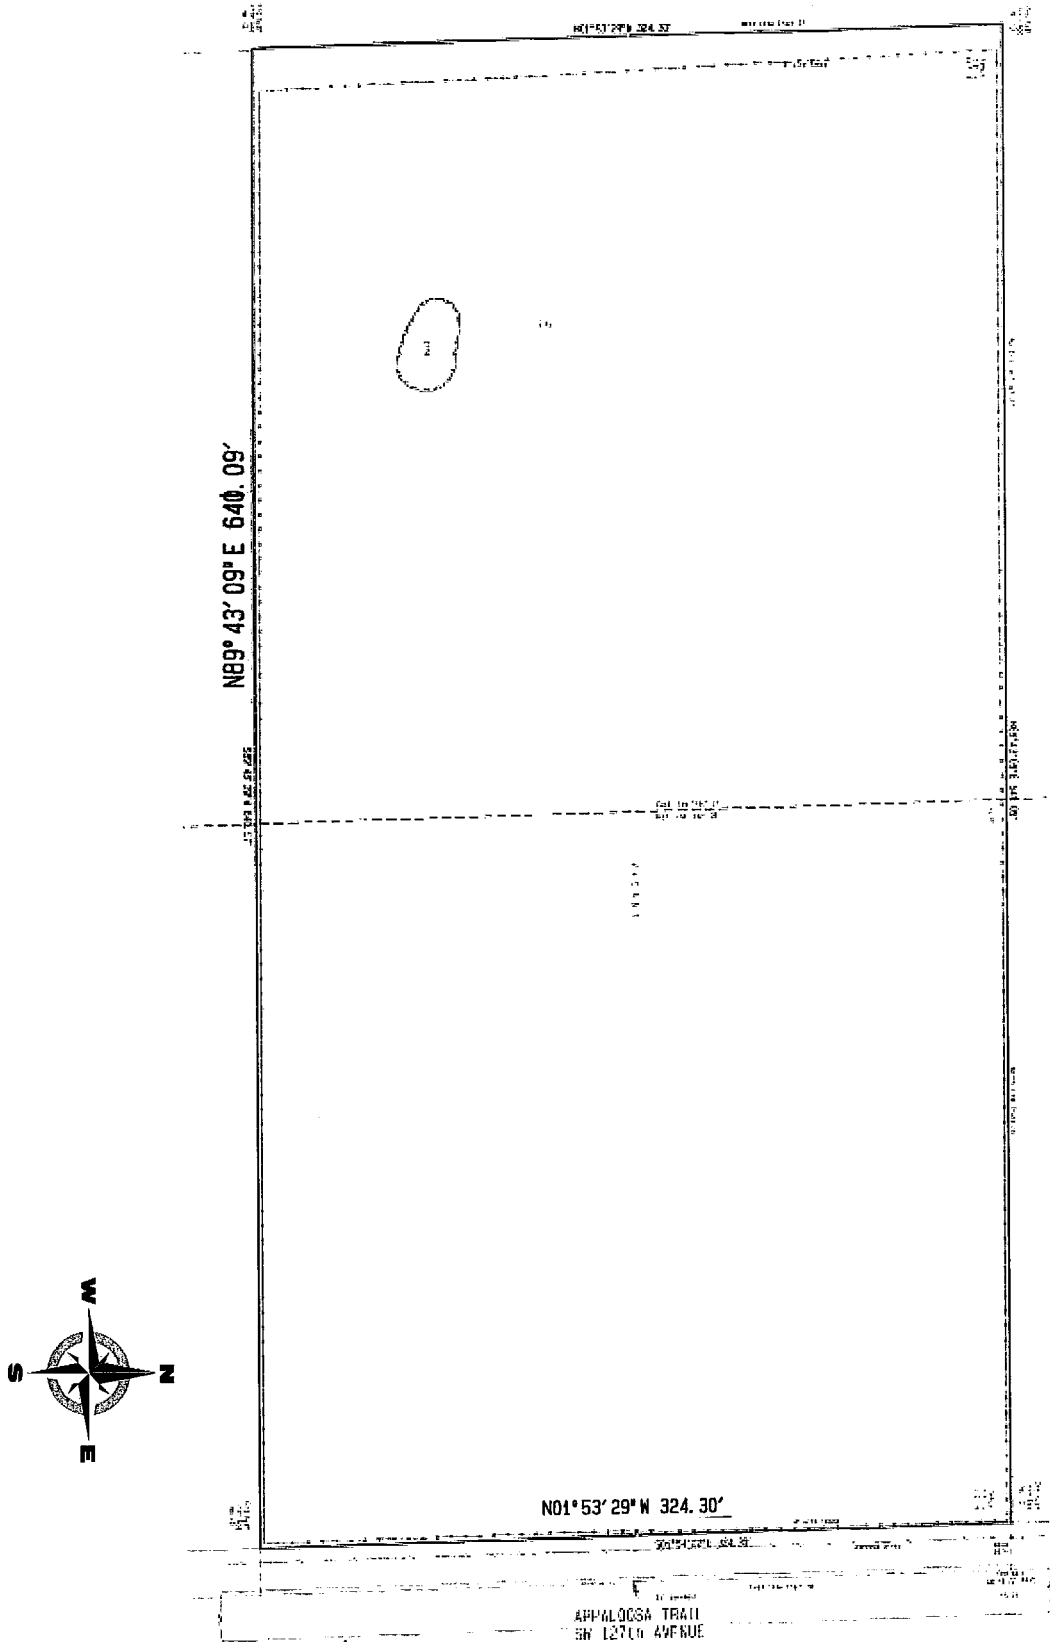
f 2) SUBDIVIDED CONDITION
